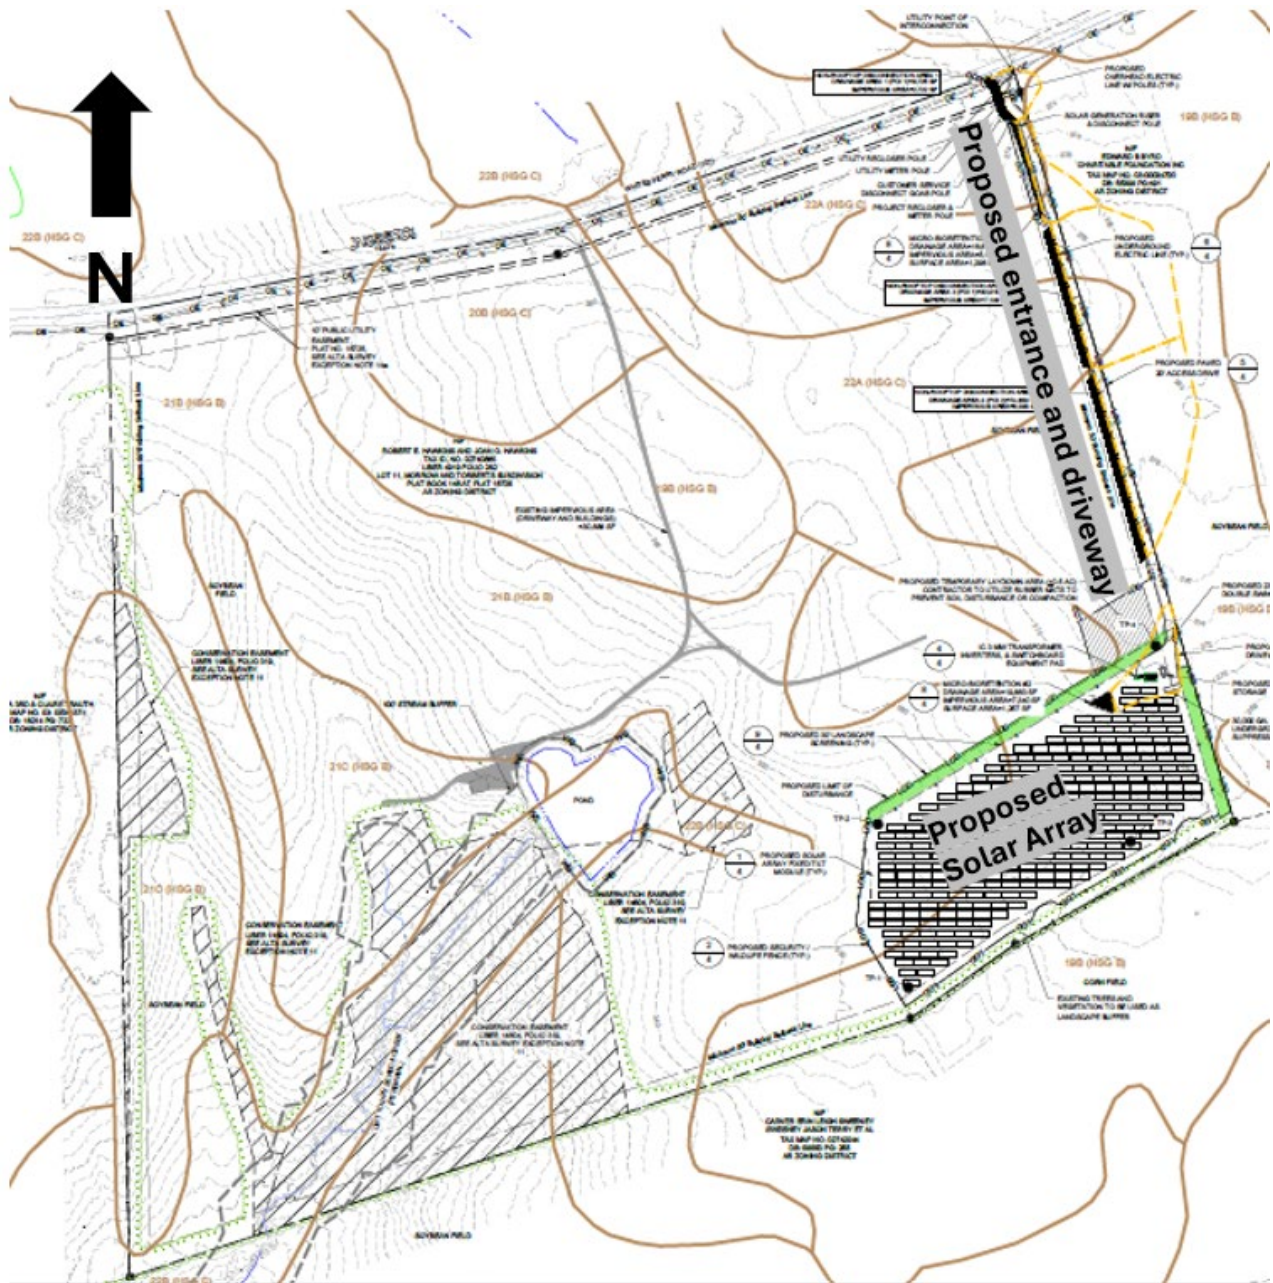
Overall Proposed Site (proposed solar array located in southeast corner)
